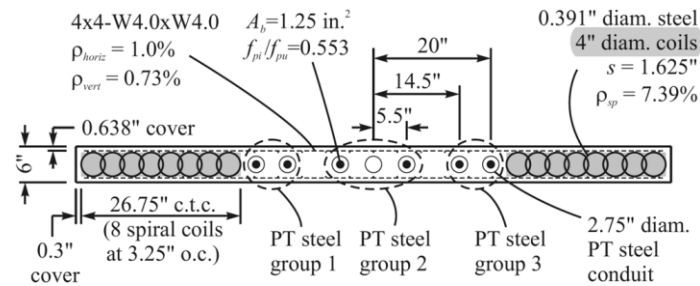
Typical wall cross section at base of spiral-confined wall panel (from Perez et al. 2004)
